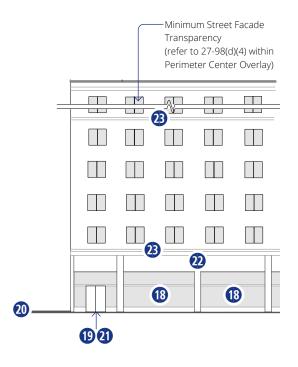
Shopfront Building: Street Facade Design Requirements
